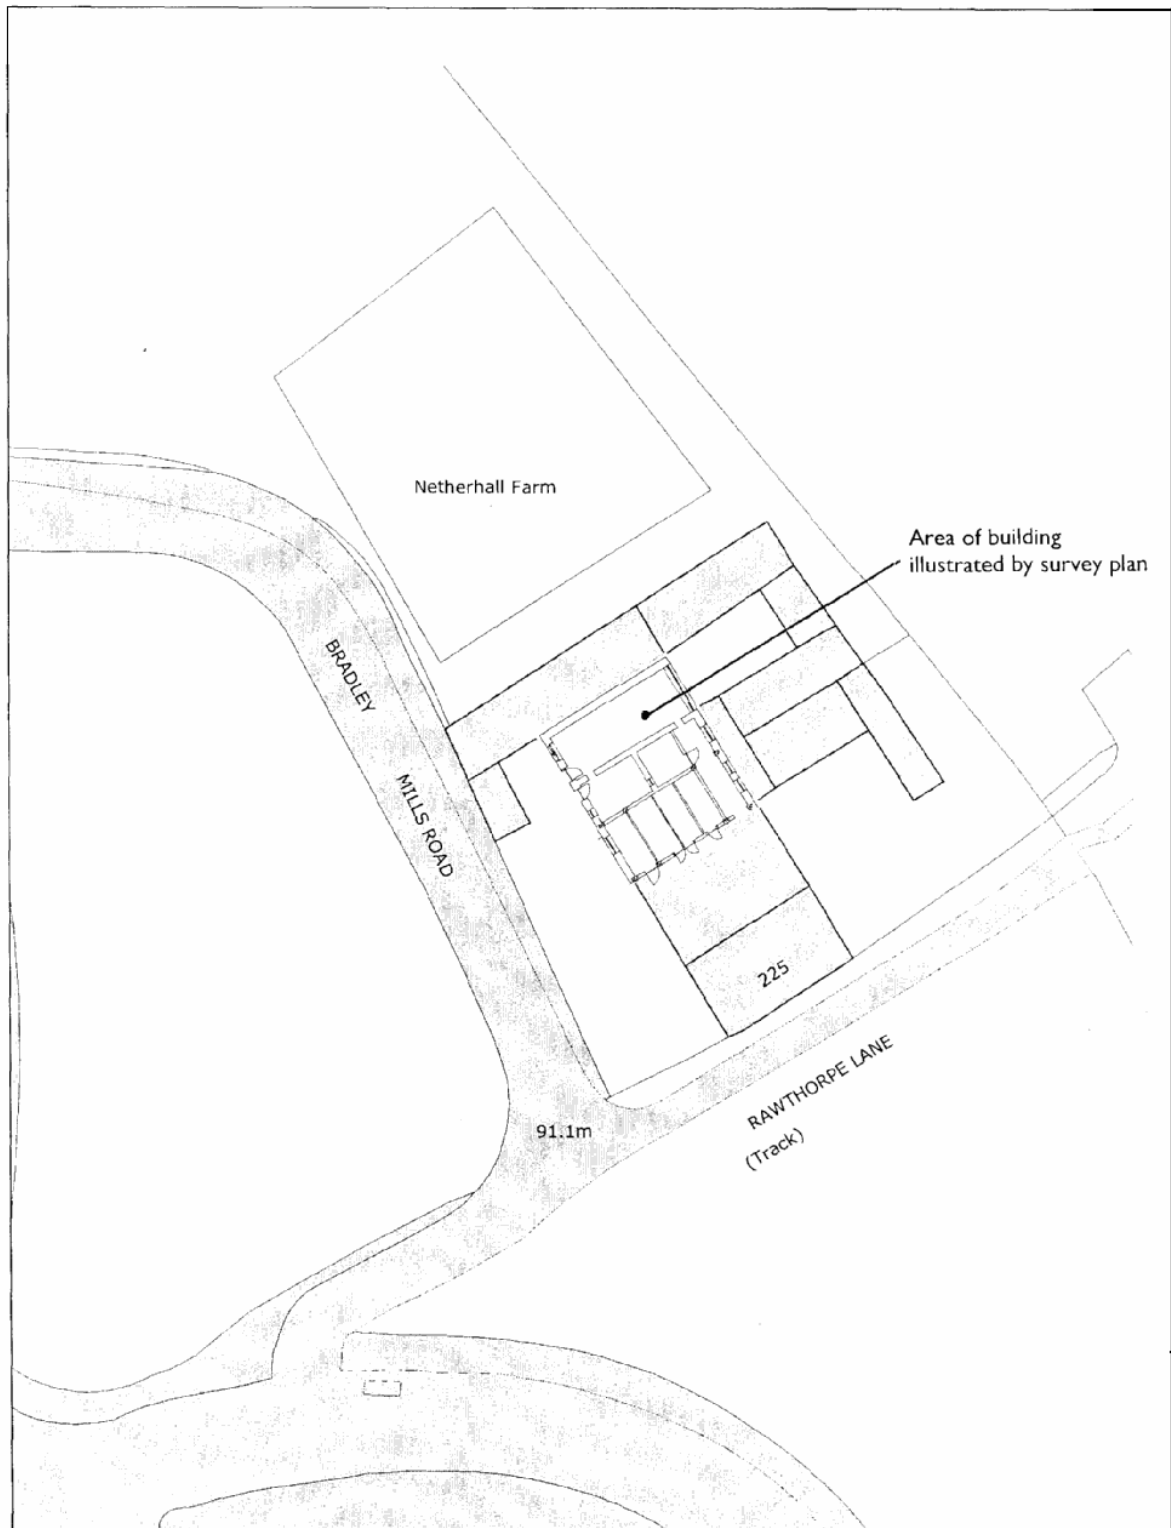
Site plan showing the area illustrated by the survey plan (R Jaques)
